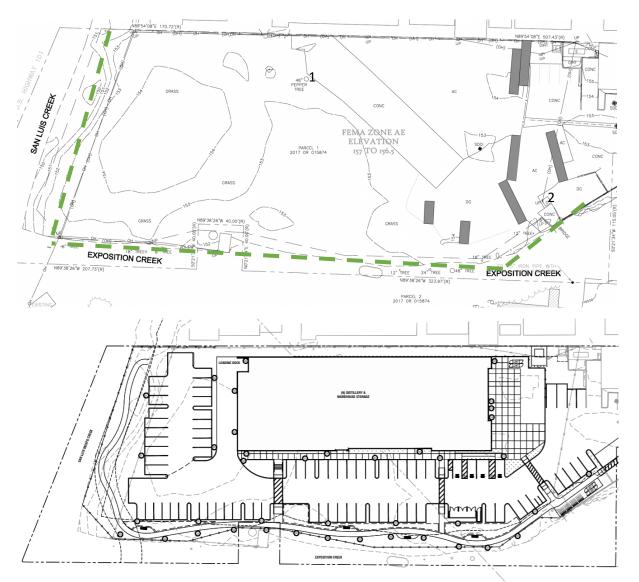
(top) site plan of existing conditions—numbered tree locations for removal. Tree protection locations in green. (bottom) A site plan of the proposed site improvements.
